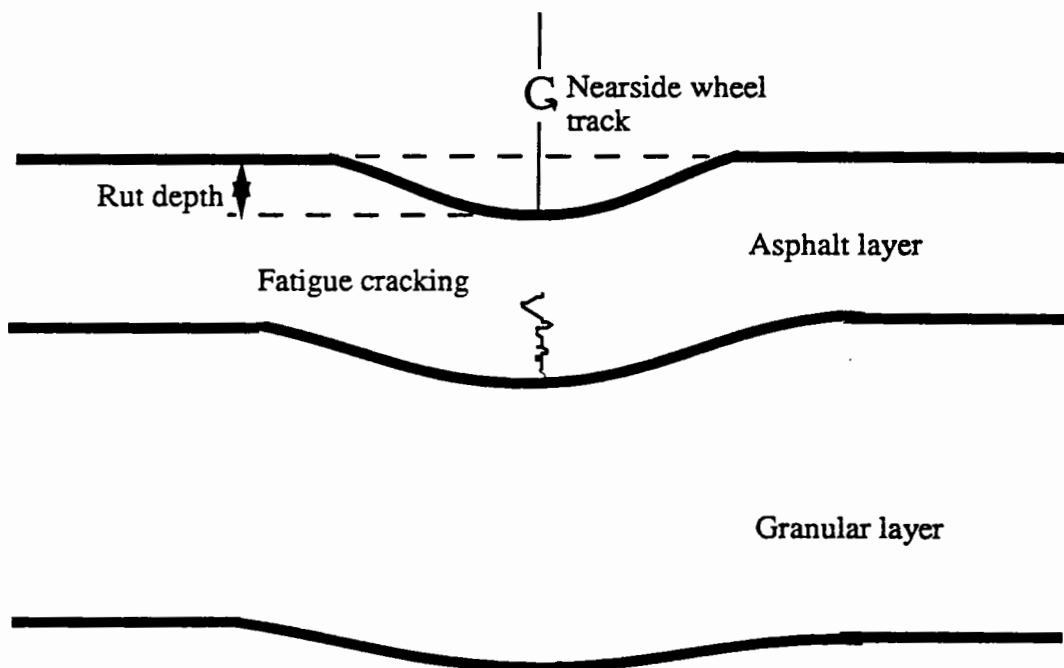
Typical failure of flexible pavement (Brown, 1990)
